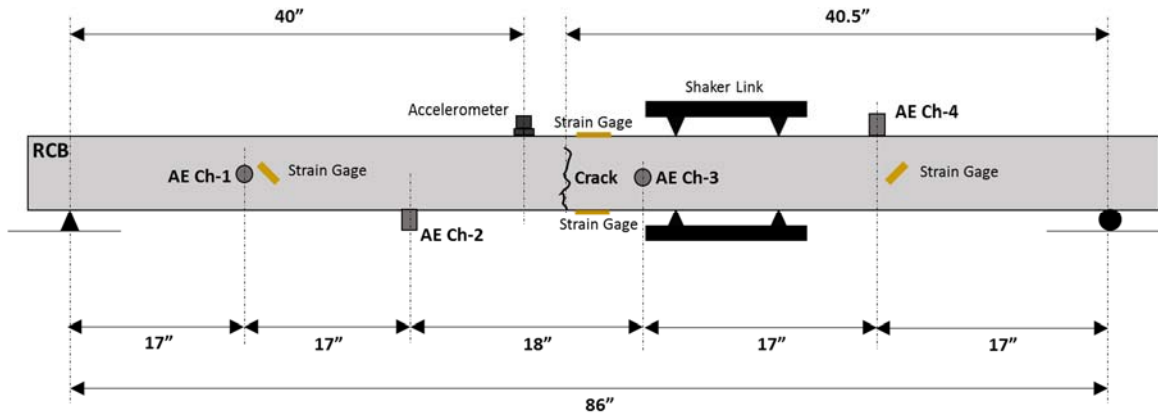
Locations of gages, AE sensors, accelerometer and crack of the reinforced concrete beam.
